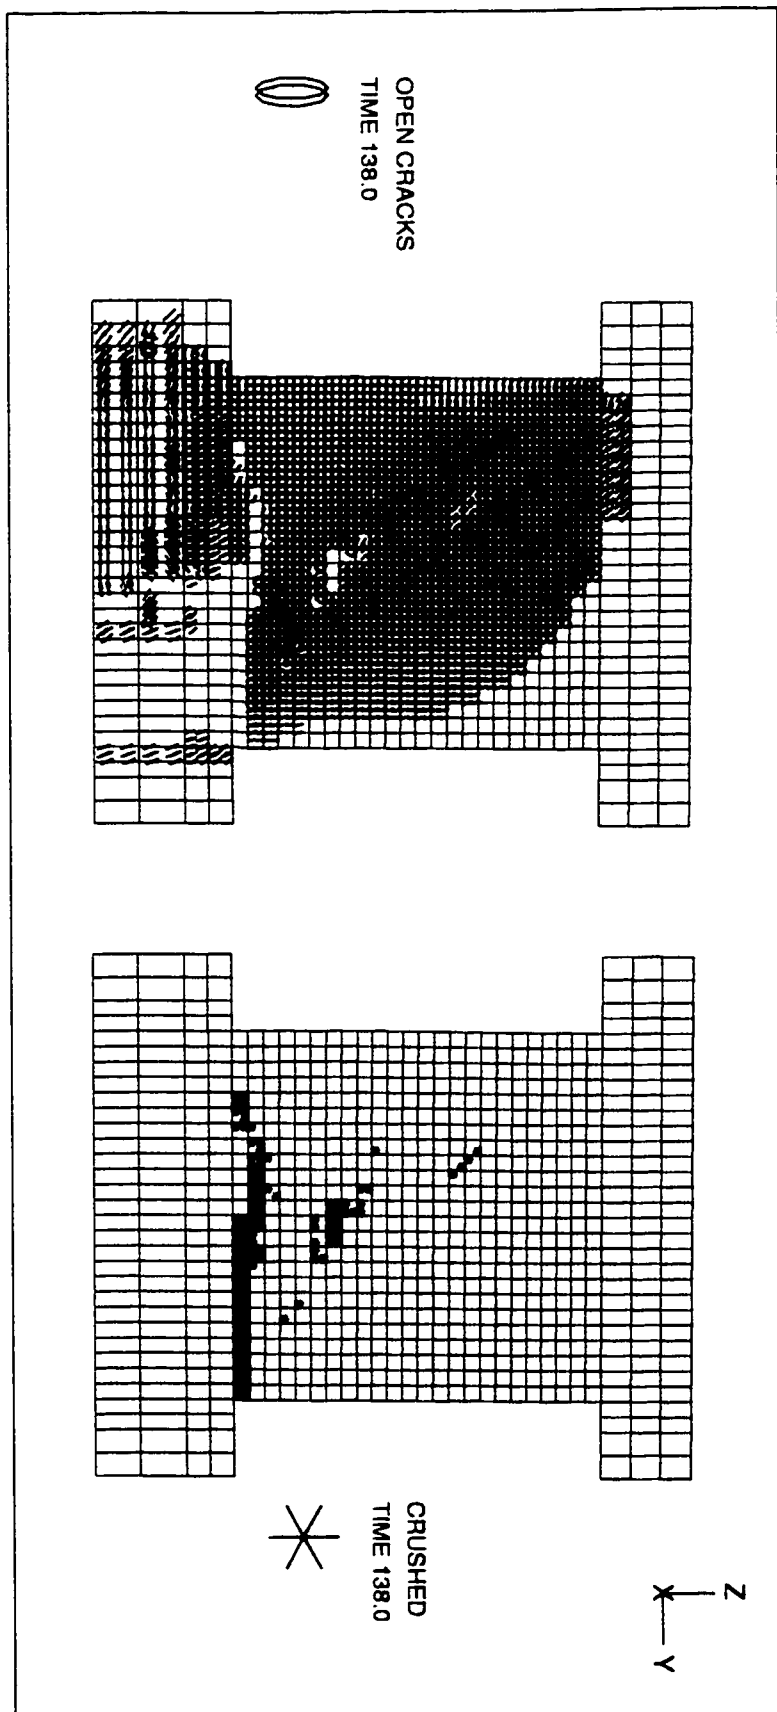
Cracking and crushing pattern of shear wall N11
